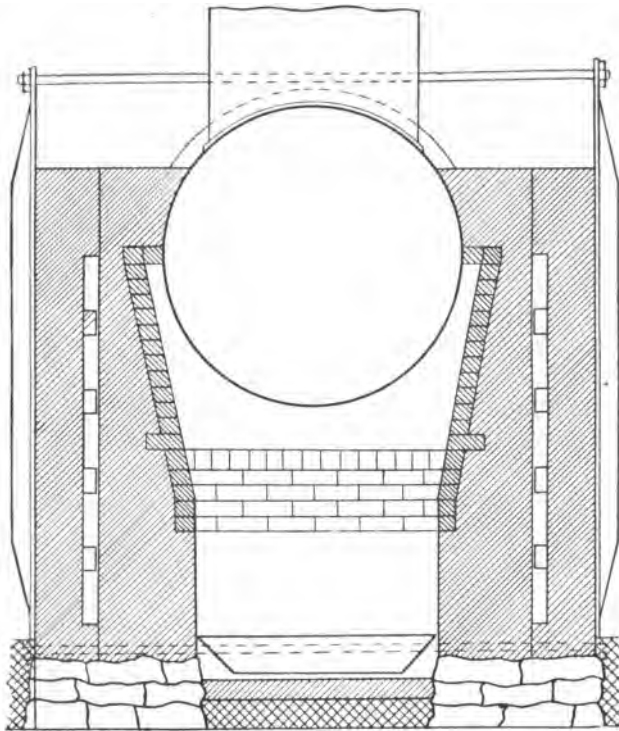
Front Elevation of Boiler in Setting, Showing Binders Bolted in Place, to Strengthen Side Walls.
